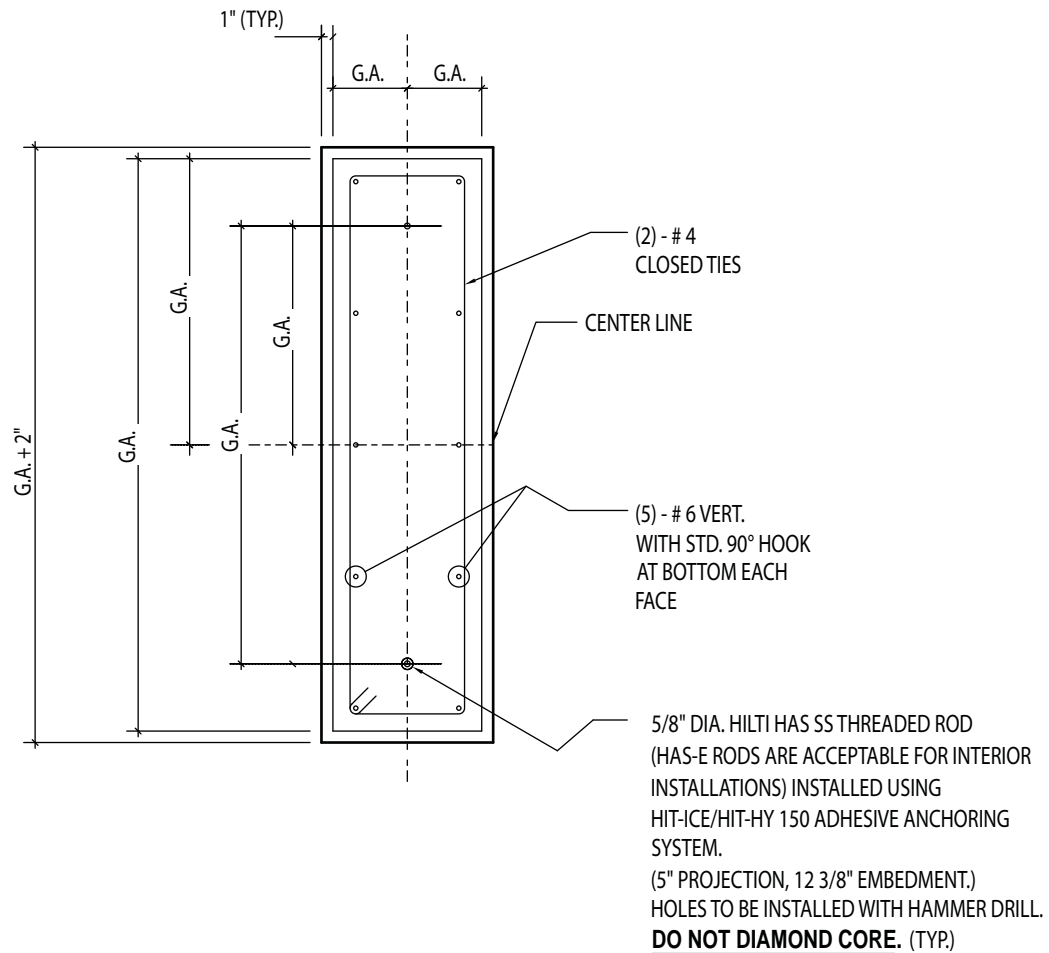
Housekeeping Pad Dimension Detail - Top View
